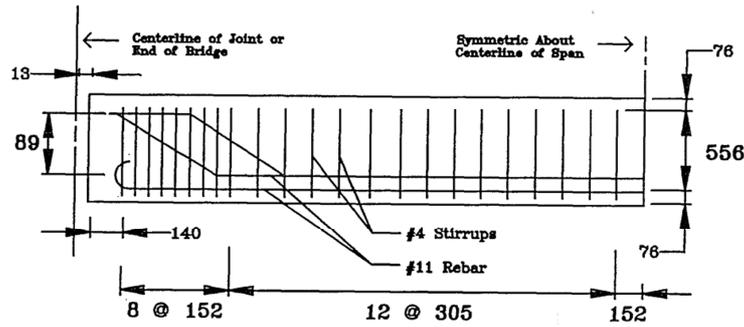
Elevation view of girder showing shear reinforcement 1 <sup>[46]</sup>
